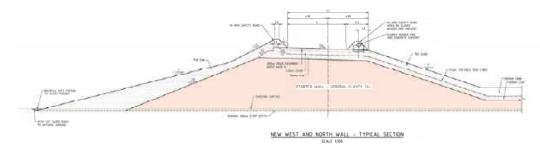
Typical Section of New West and North Wall (Drawing No. WG005481)
